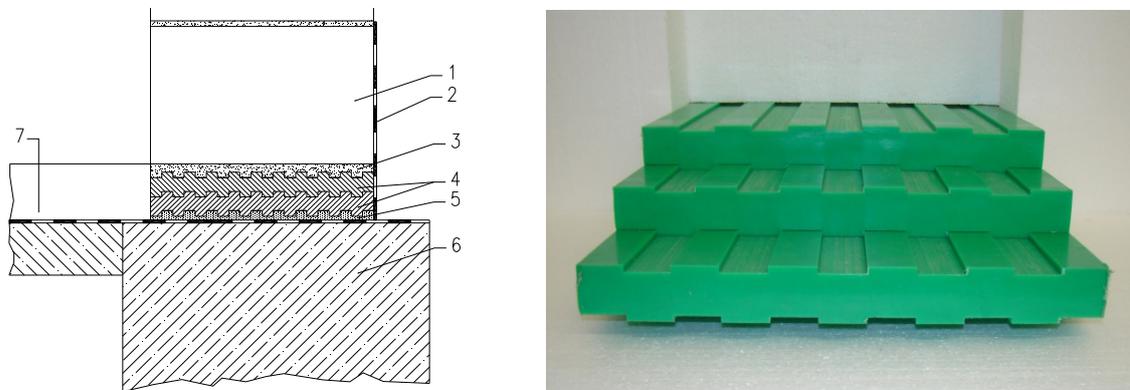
Insulation block: 1 - masonry, 2 - water-proofing, 3 - cement mortar or concrete, 4 - insulation block, 5 - paste, 6 - foundation, 7 - floor
